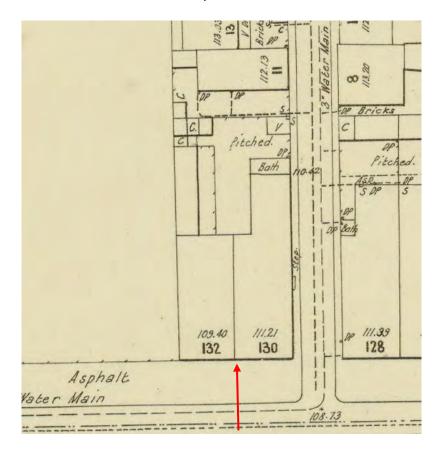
MMBW detail plan no. 1178, 1896, with nineteenth century buildings indicated. Note street numbering has since changed, and 144-146 Queensberry Street is shown as nos 130 and 132 Source: State Library of Victoria
